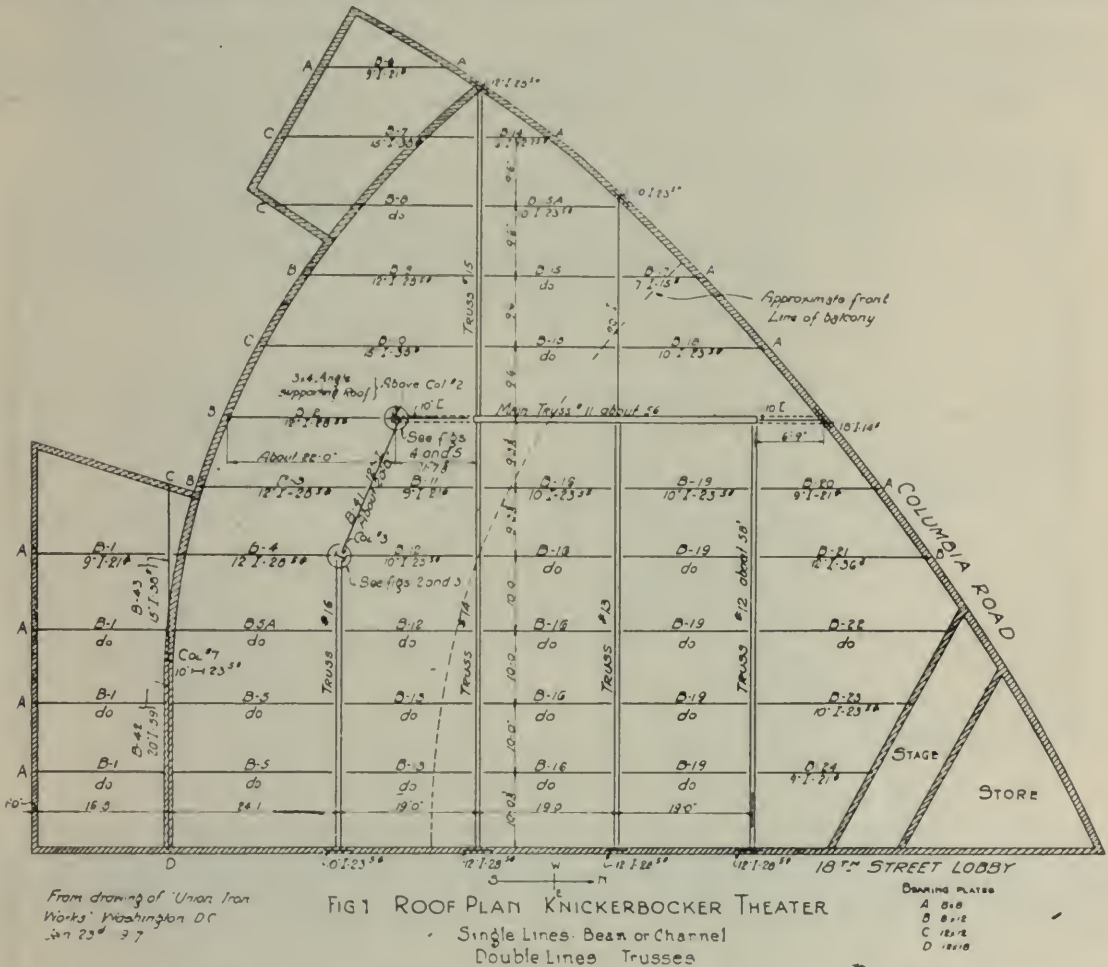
Diagram of the roof plan, traced from the one on file in the Washington Building Department, but made more clear by using double lines for the trusses and adding dimensions. Also "column No. 2" is shown as a single angle at the roof surface instead of an "H" section, as on the original. Trusses Nos. 12, 13, 14 and 15 connected to truss No. 11, which latter extended south from the Columbia road wall column No. 2. Truss No. 16 extended west from the east wall to column No. 3. Between columns Nos. 2 and 3, there was a diagonal 12-inch I-beam (B-41) about 20 feet long which supported two concentrated loads at its center, one from a 12-inch I-beam about 22 feet long, and the other from a 9-inch I-beam about 15 feet long.
